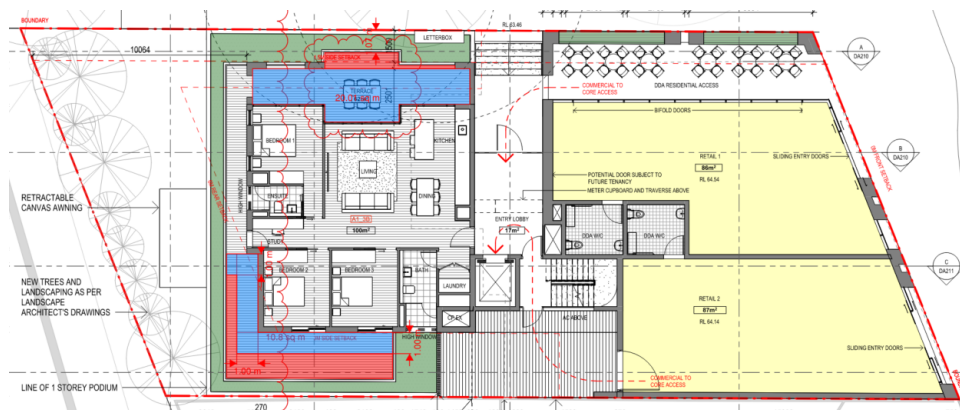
Proposed level 1 floor plan showing the reduced balcony to Unit 1 with various markings - 18-20A Perouse Road, Randwick (Source: Curzon & Partners)
